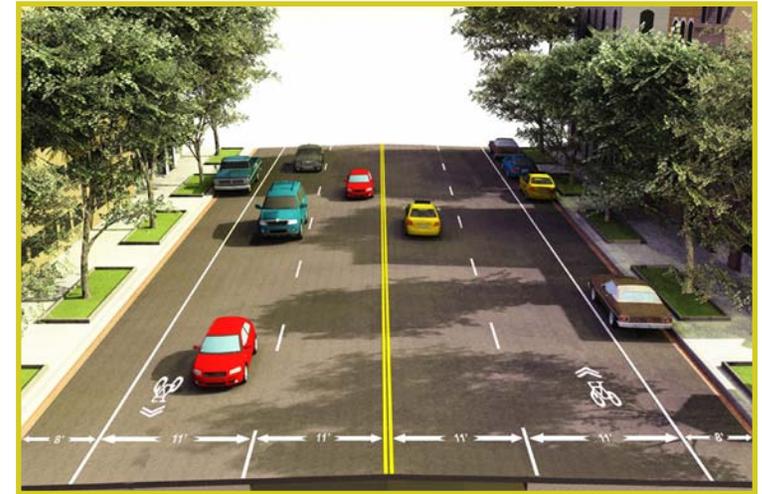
Recommended Roadway Section for Georgia Avenue North of Columbia Road
